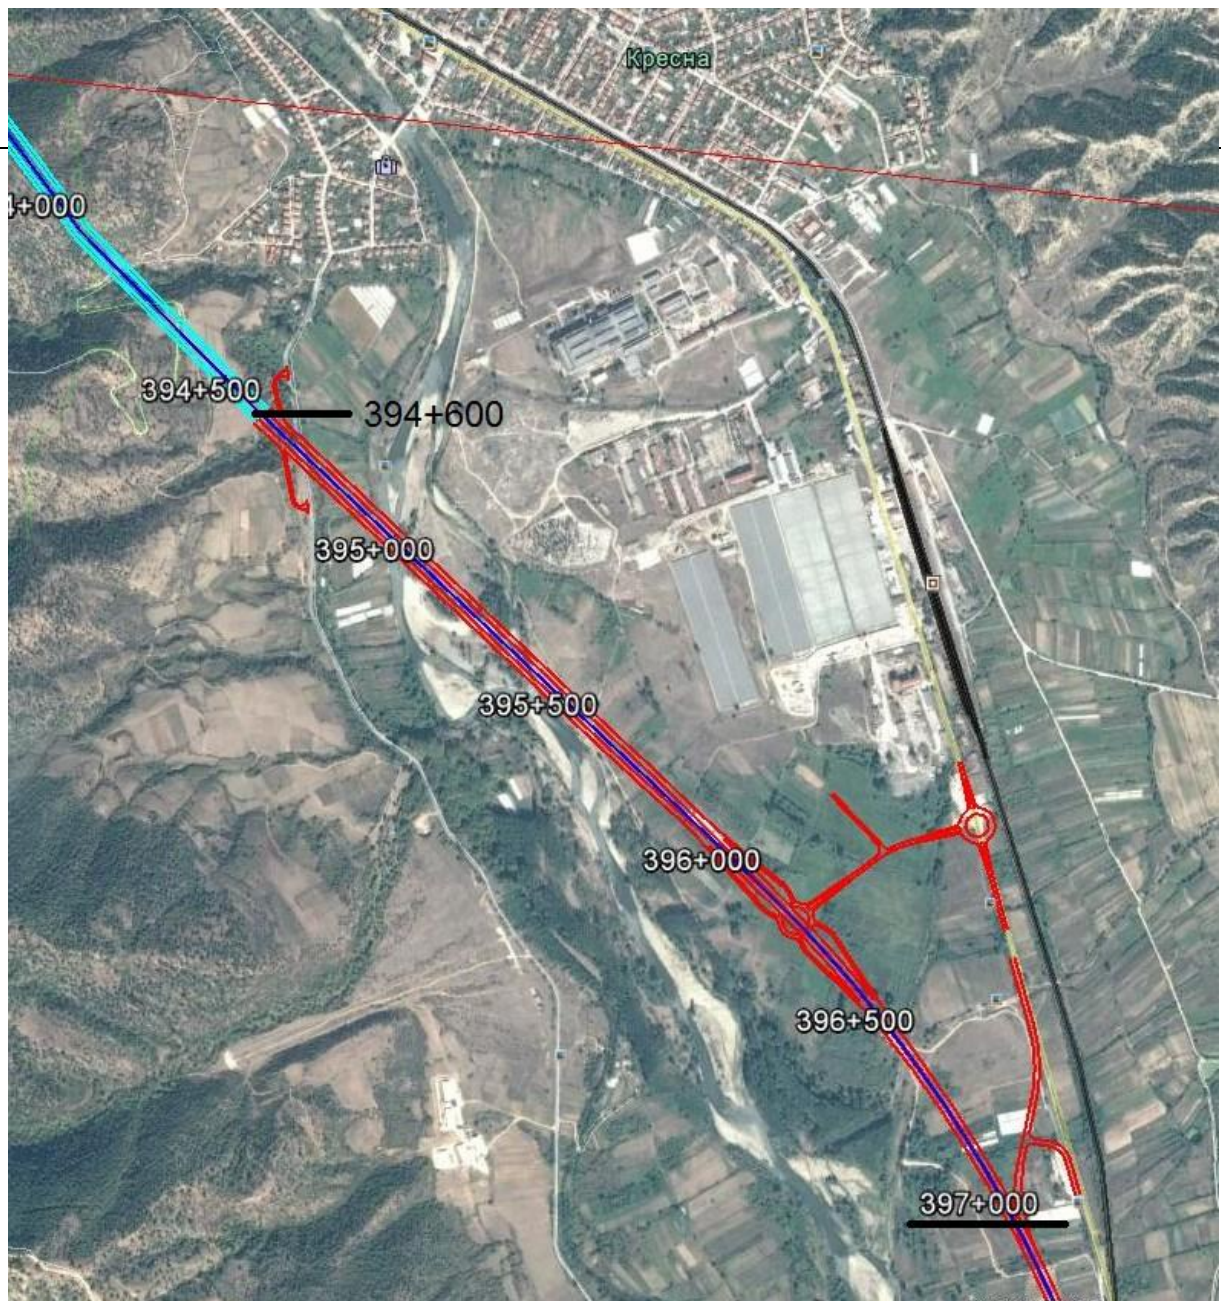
Situation of the road section, km 394 + 605 south portal, right roadway of Kresna tunnel, km 394 + 600 south portal left roadway of tunnel Kresna, end of route 397 + 000, where it enters Lot 3.3.
